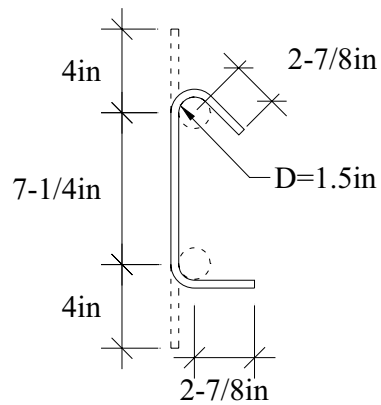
Cross Tie Detail; Specimens B1, B2 & B3
